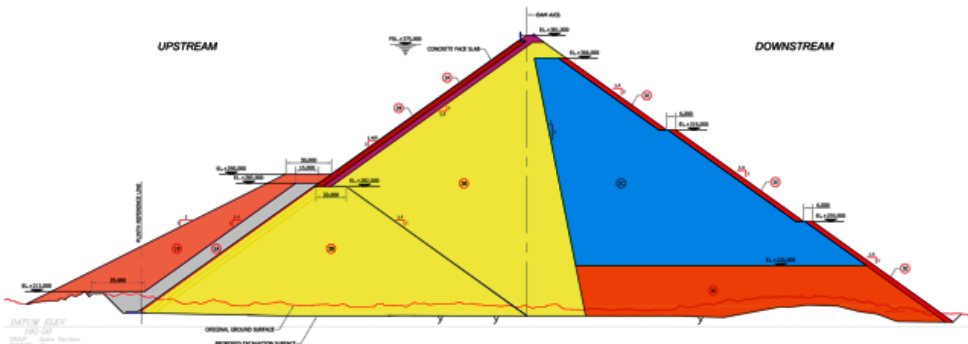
Configuration of NN2 Concrete Face Rockfill Dam
